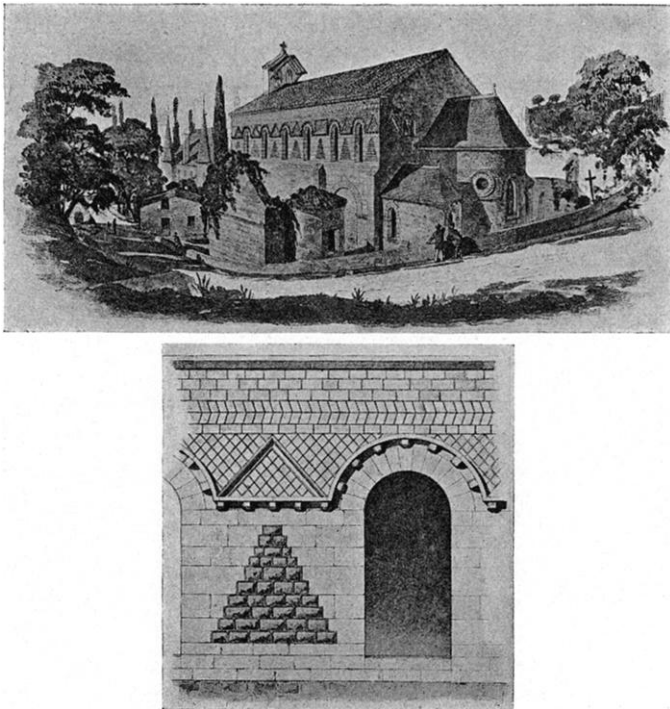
ST. GÉNÉROUT: GENERAL VIEW AND DETAIL OF LATERAL FAÇADE.
